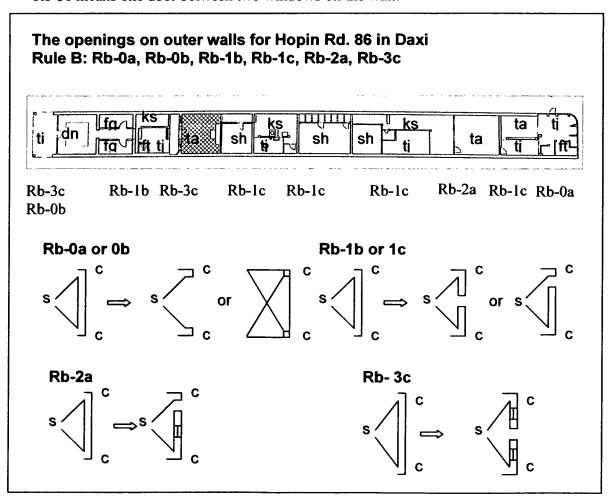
22 Rule B for illustrating the openings on outer walls for floor plans at Hopin Rd. 86 in Daxi
